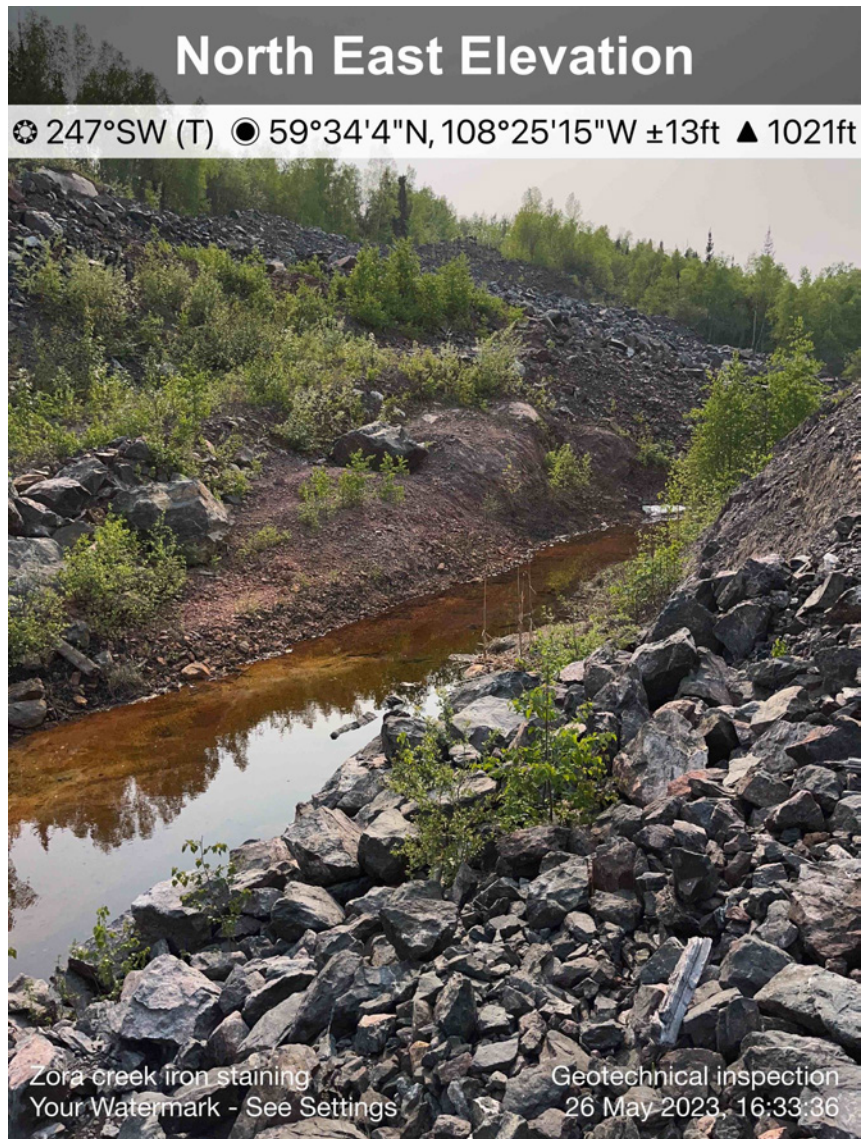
View from level crossing looking upstream towards Zora Lake (May 2023)
